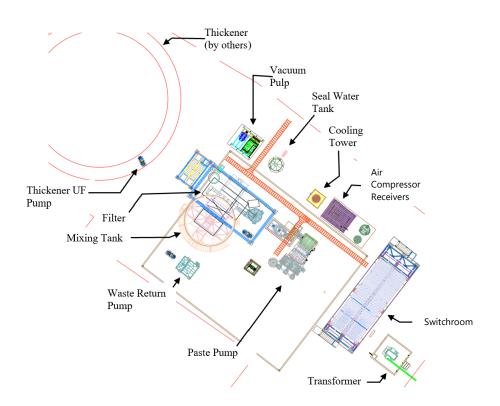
Plan View Showing Major Equipment Arrangement at the Process Area
